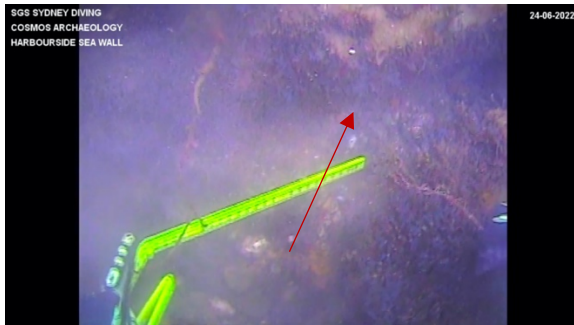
Section of undermining at base of stone wall 16 m along survey line, indicated by red arrow. (Image 220624_Stone seawall dilapidation_1, 06:43)
